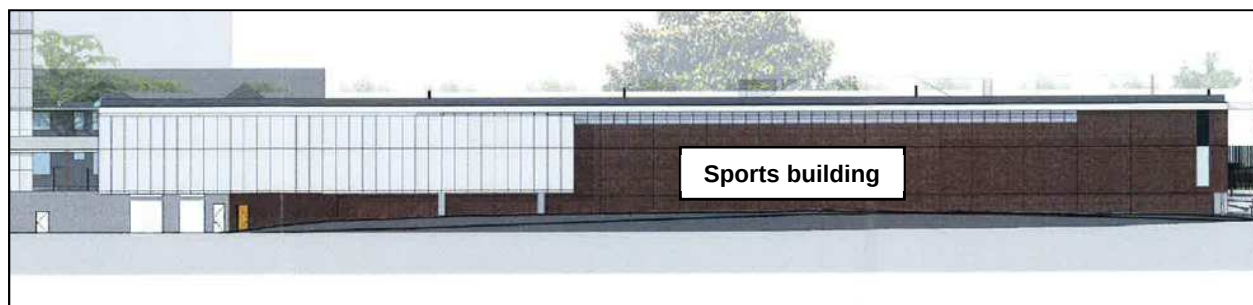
Approved sports/movement complex north elevation (Source: DPE)
